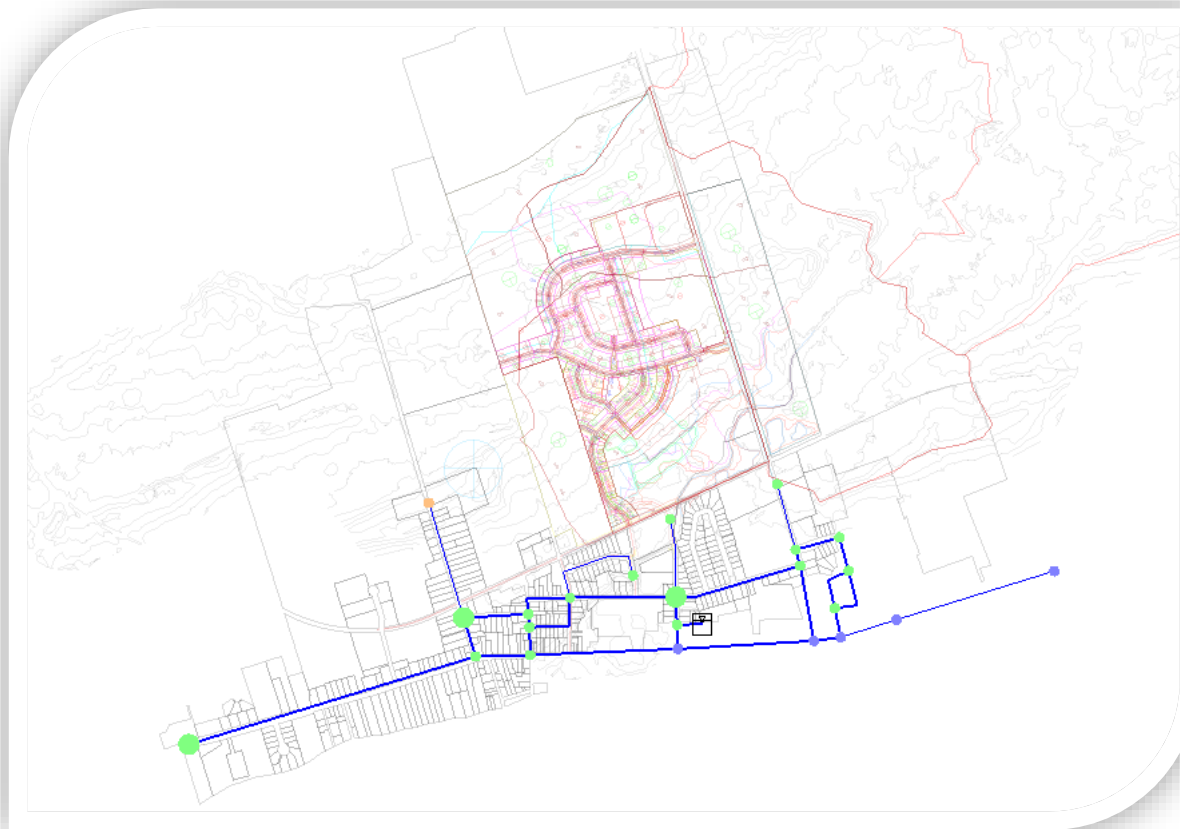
EXISTING WELLINGTON WATER STANDPIPE, EXCERPT (TSH 2006)
